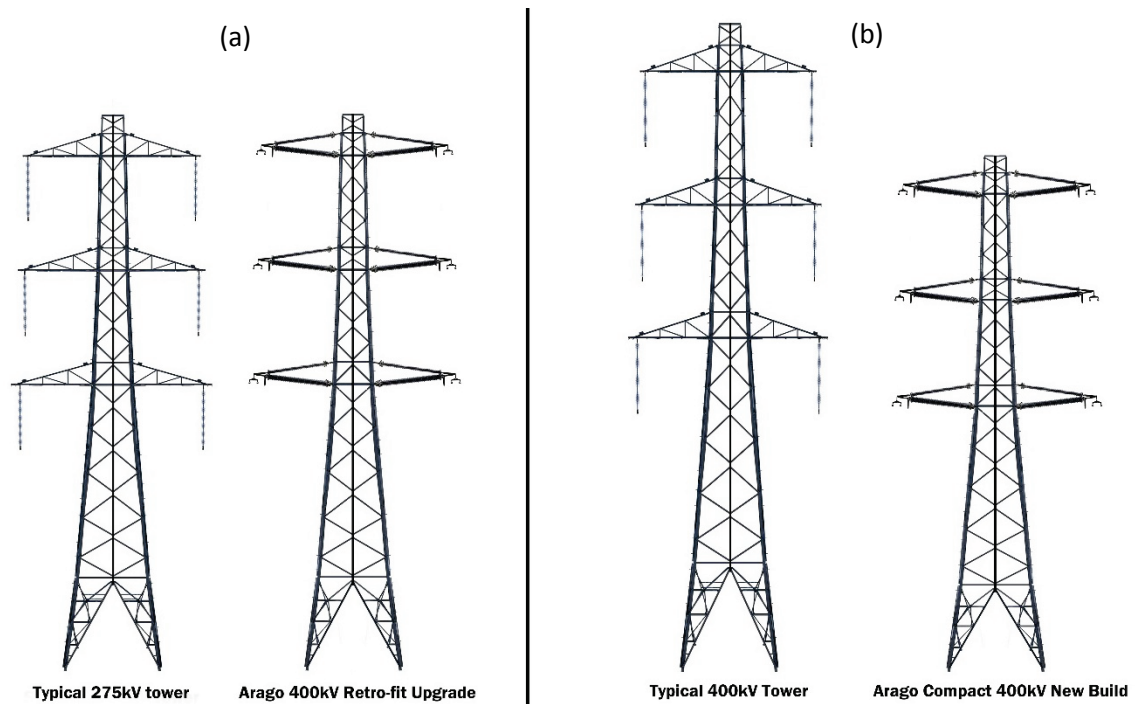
400 kV Arago insulating cross-arm used for retrofit installation (a) or new build (b)
